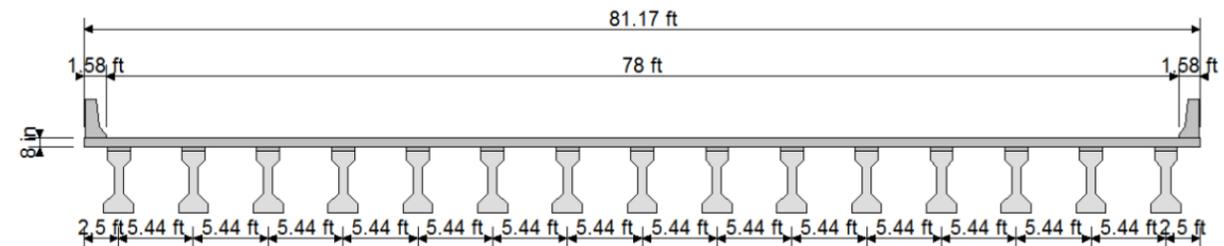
SR30 over Cotton Lane, Typical Section (AASHTO Type IV)
